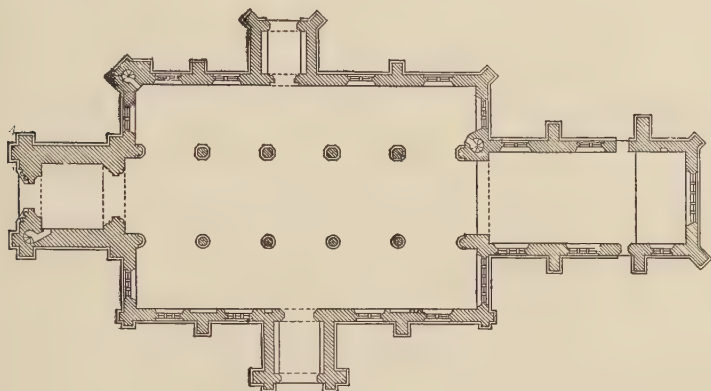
PLAN OF WARMINGTON CHURCH, NORTHAMPTONSHIRE
